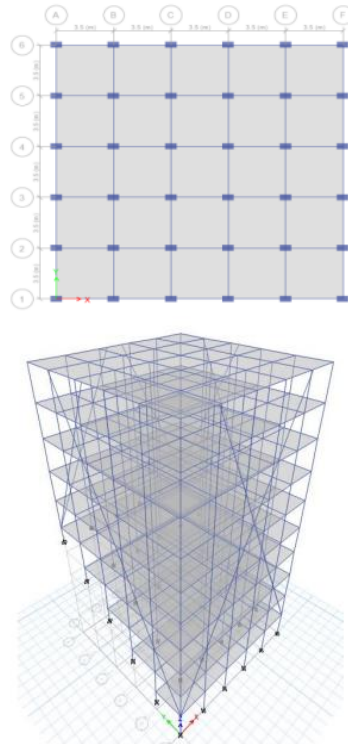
Plan and 3D Model of Sloped Building with 63° Diagrid Bracing
